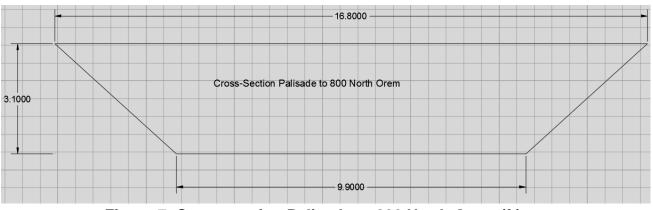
Cross-section Palisade to 800 North Orem (ft)
